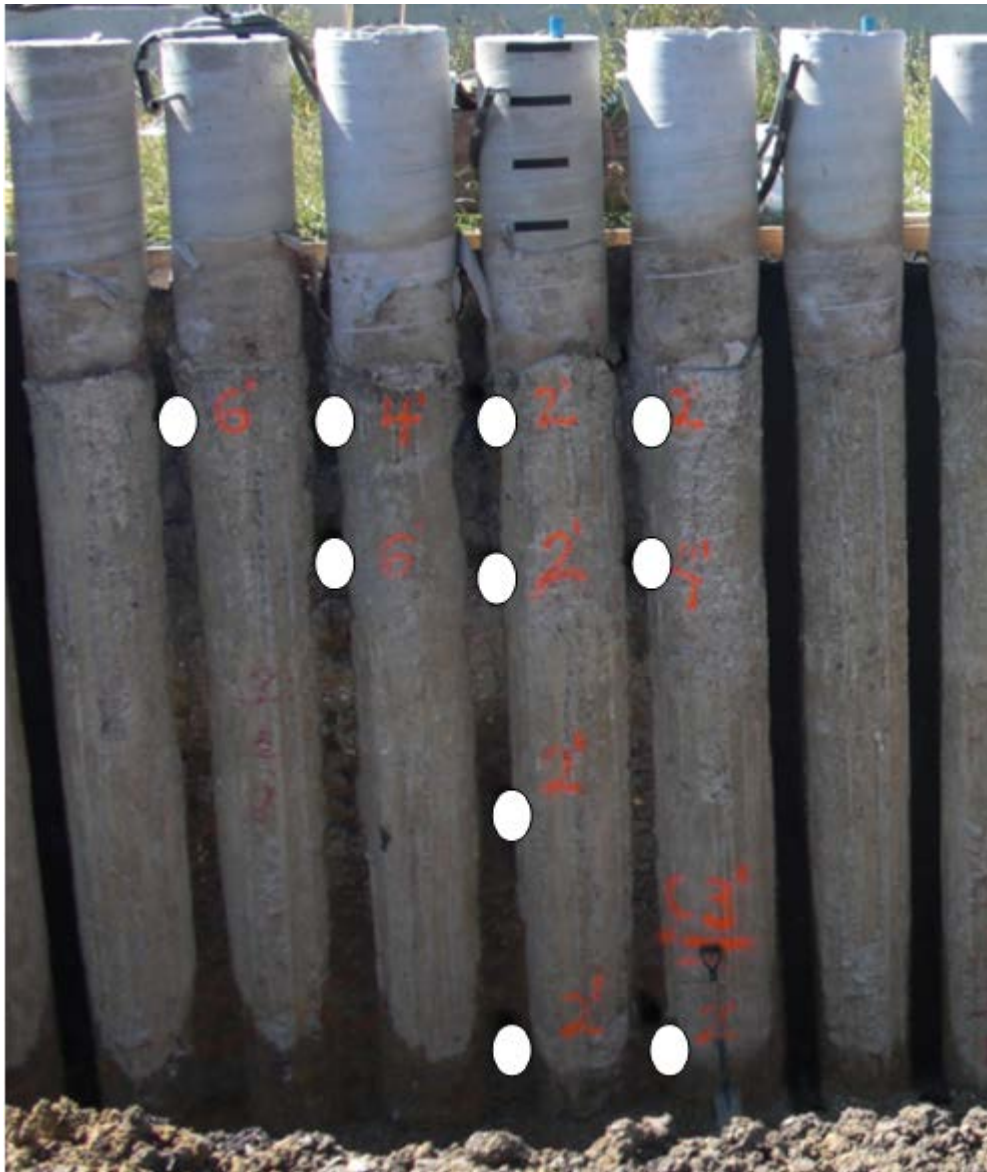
Layout of TDR probes installed through the facing of the wall
